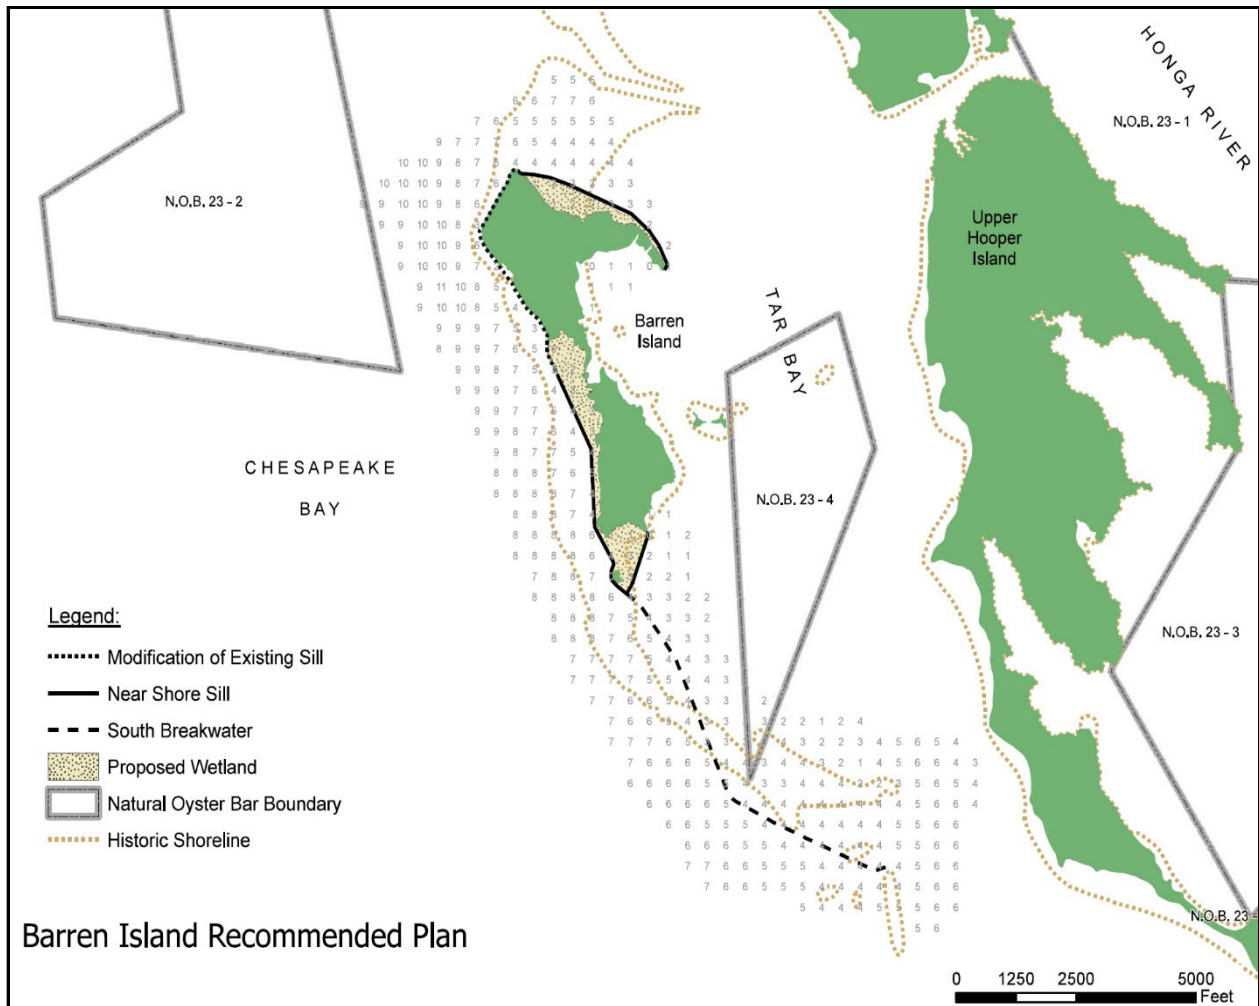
Barren Island Recommended Plan from Feasibility Report (2009)
